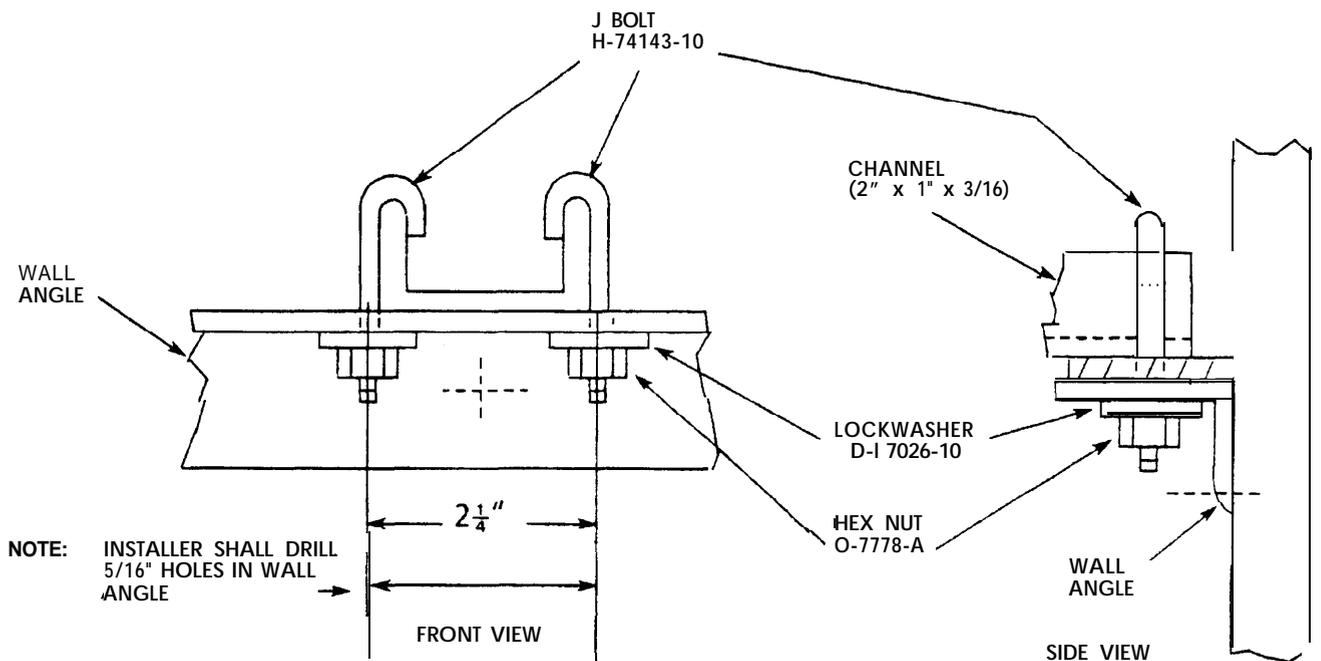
Side View and Front of Channel Brace Fastened to Wall Angle.
